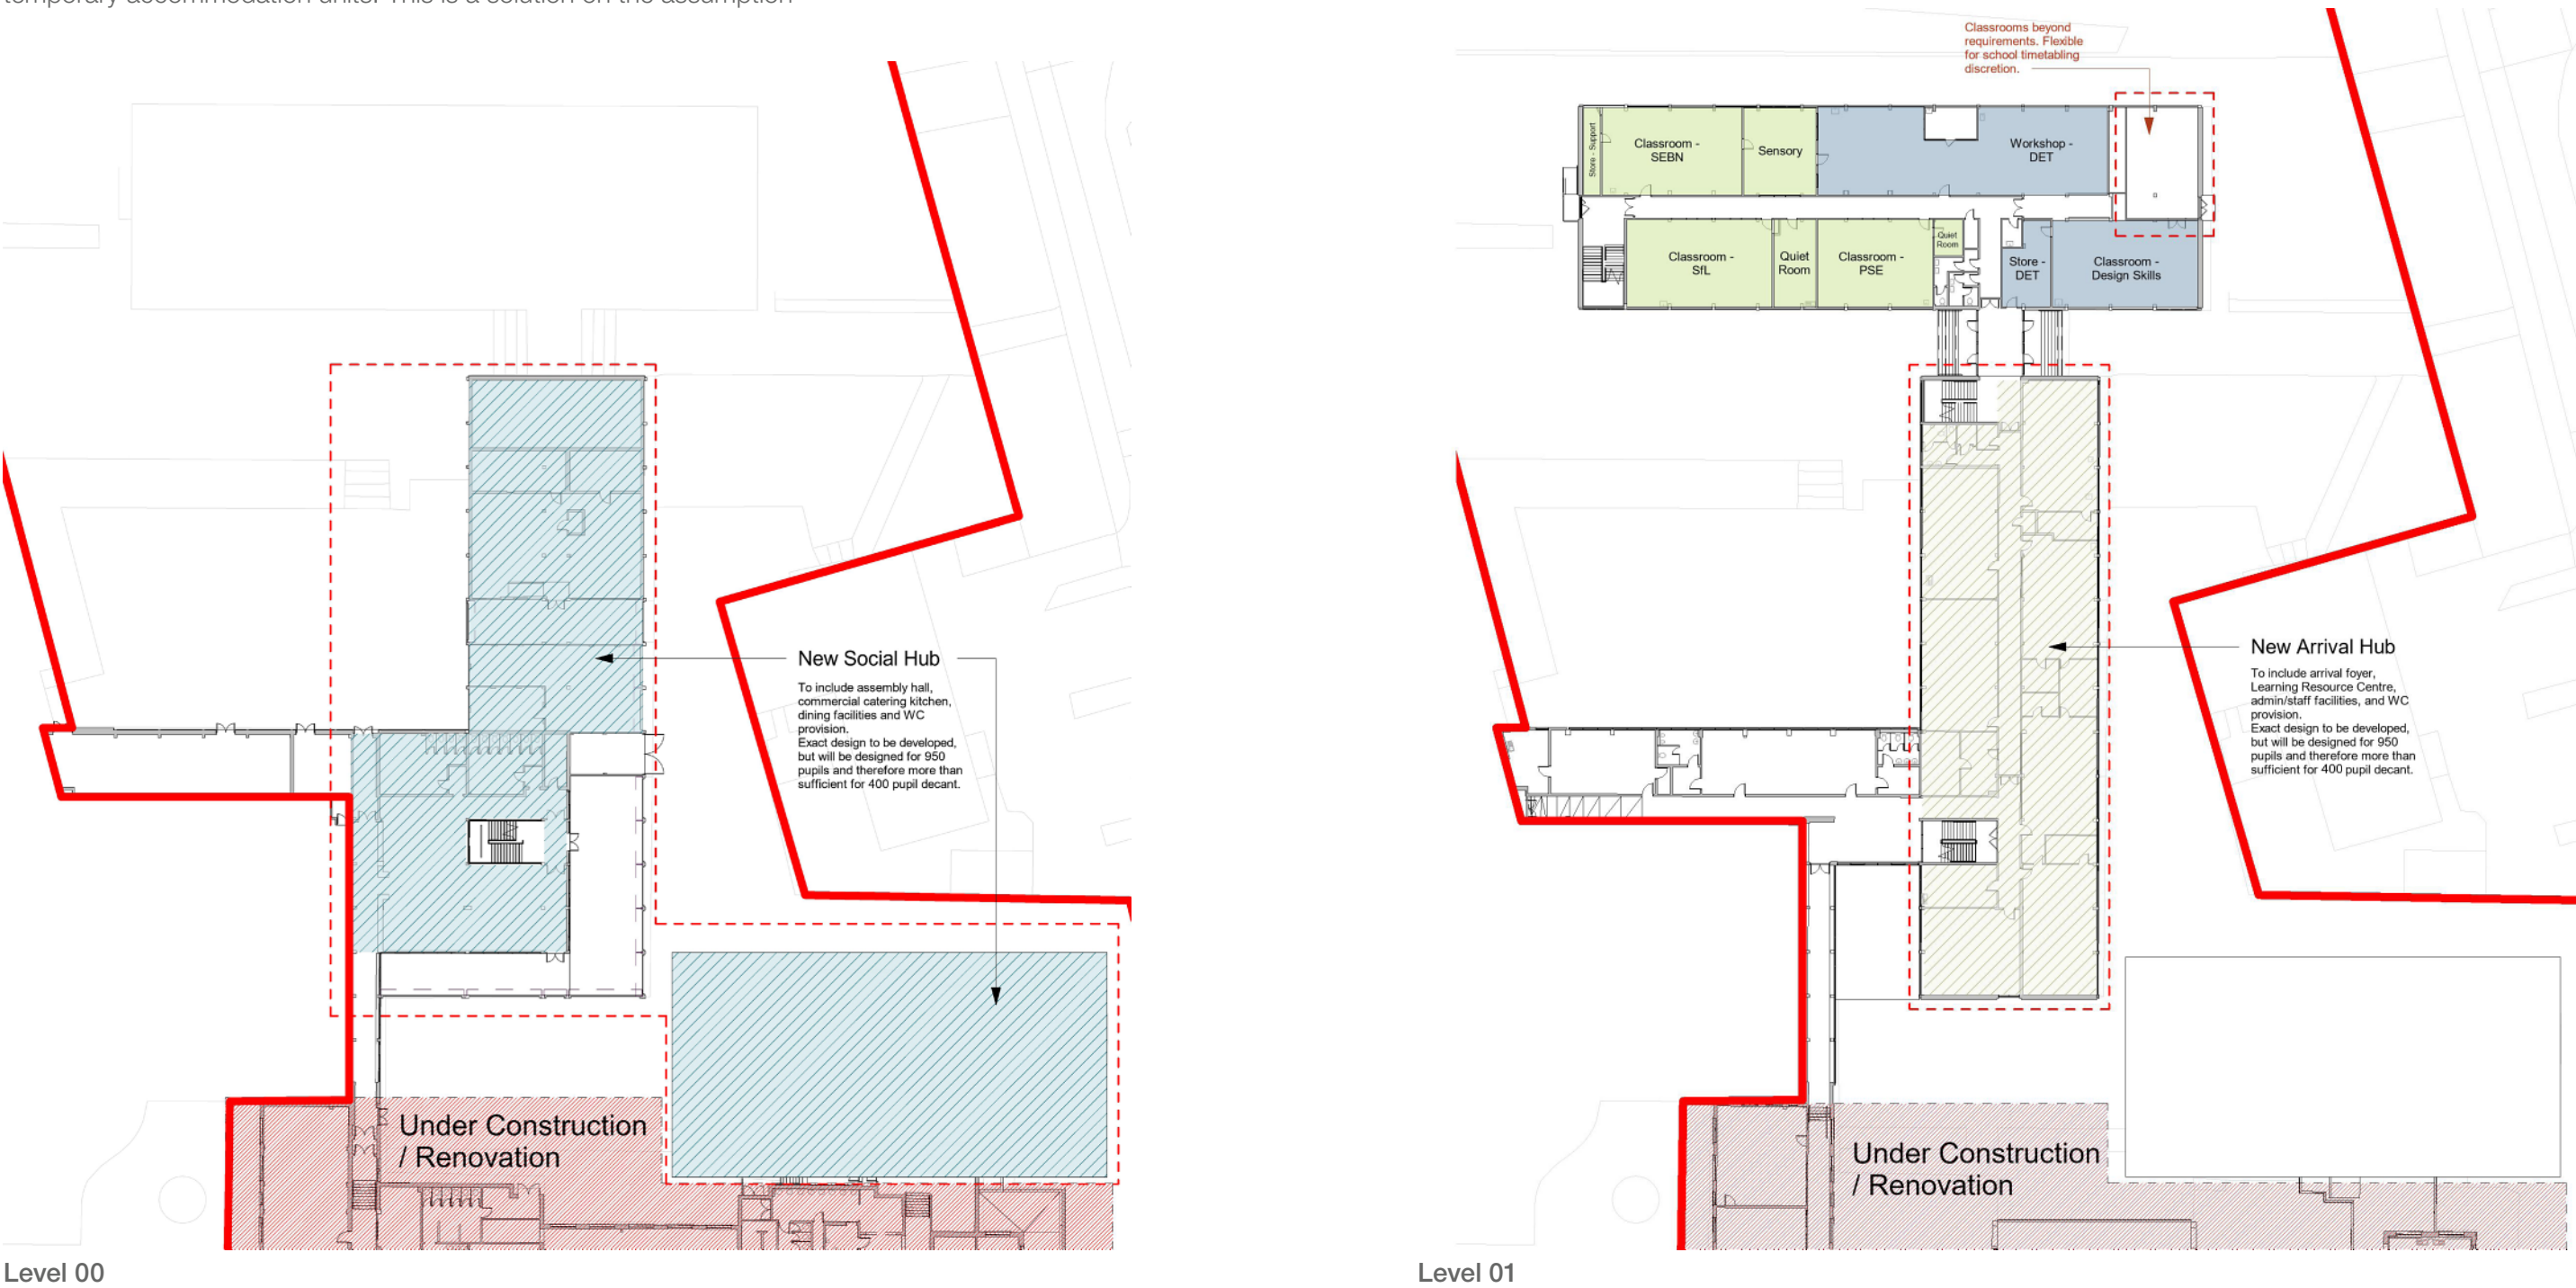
Floor Plan Layout for S1-3 Pupils in 1960s Building (Level 00 and 01)
